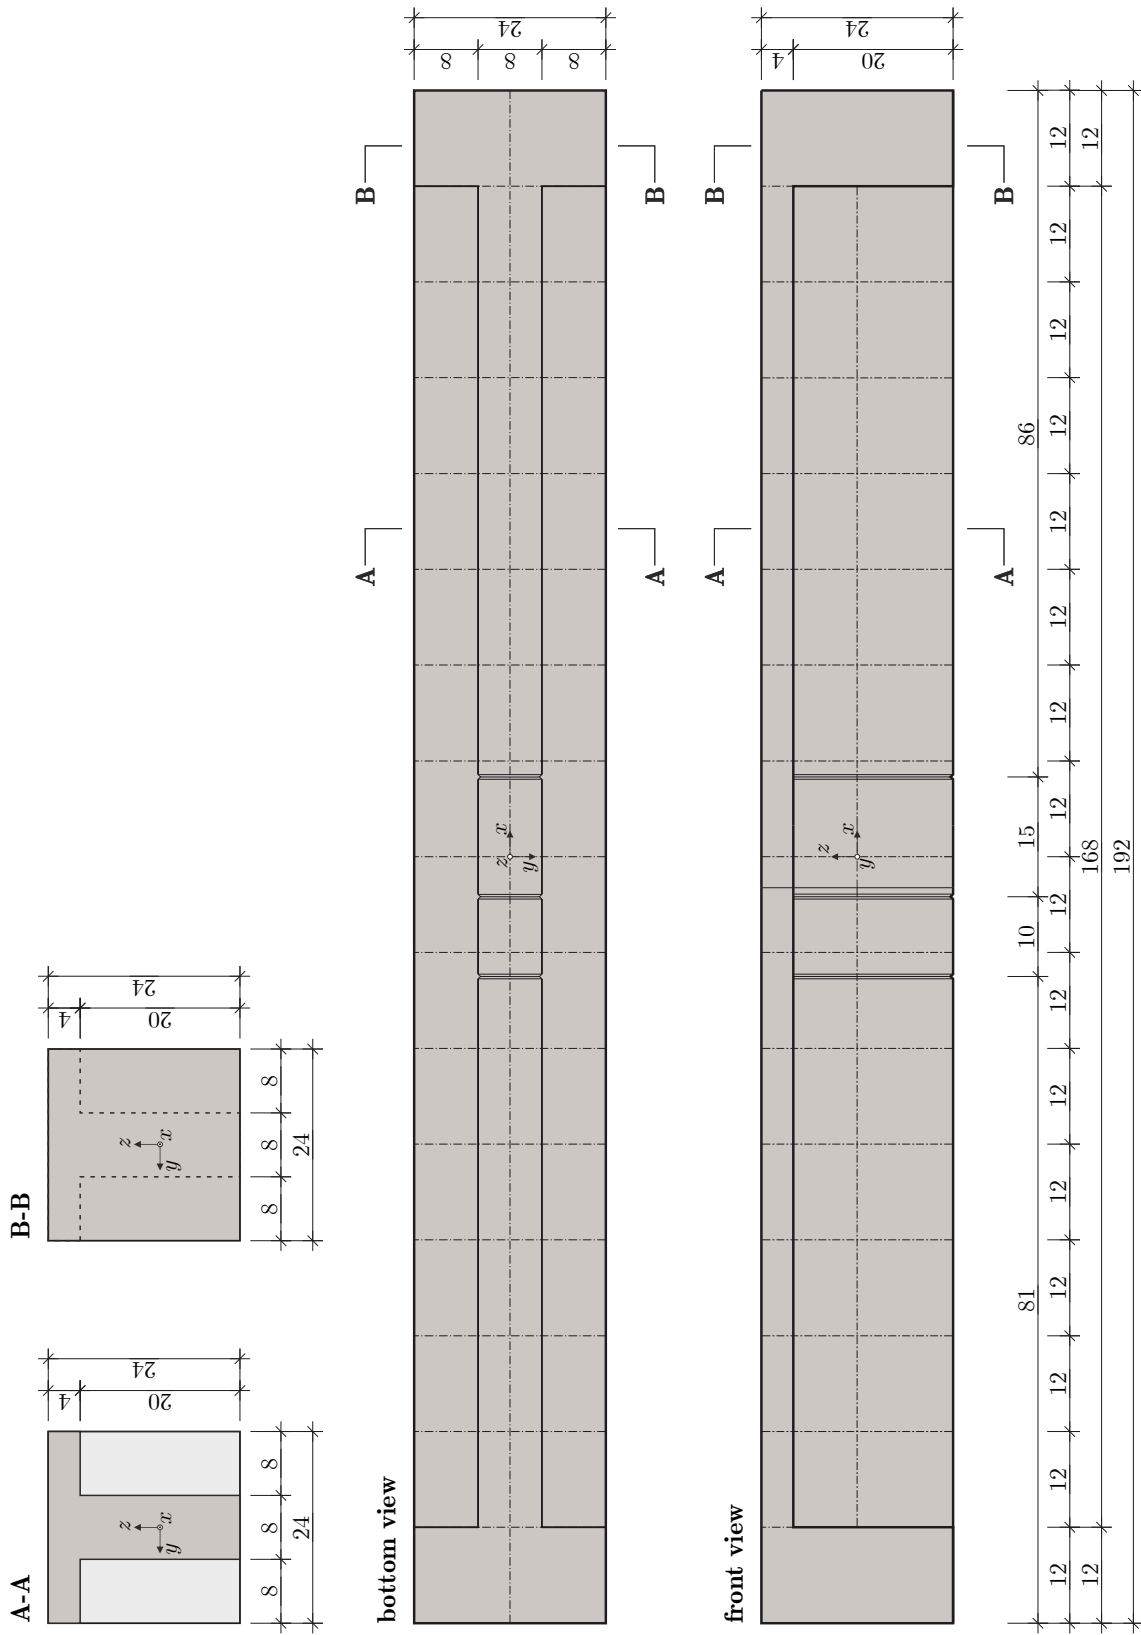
Large T-shaped concrete beam *SnowWhite*. Dimensions in inches ($1'' = 25.4$ mm).
